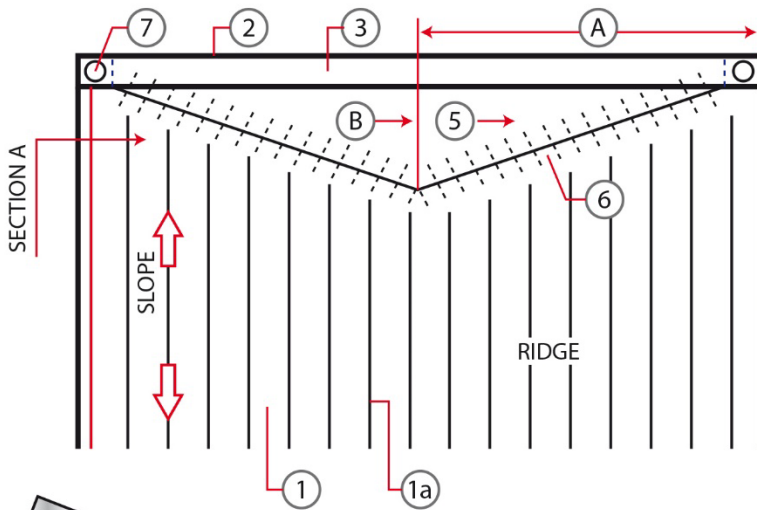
, EXISTING PARAPET WITH SURFACE MOUNT COUNTERFLASHING
